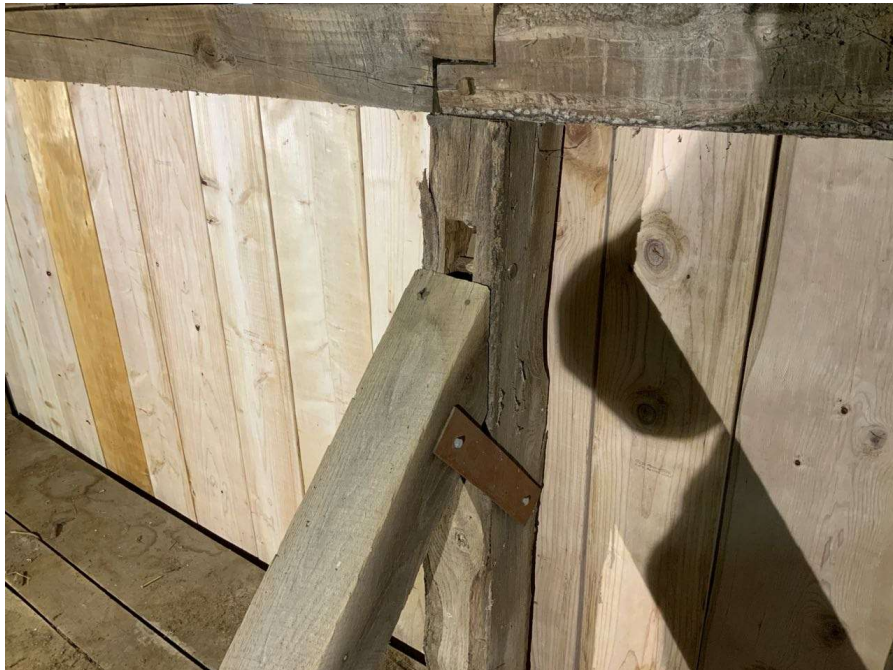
Typical disconnected brace slipping out of the mortise joint at top connection to column at perimeter of structure in hayloft. Column C/1 shown looking northwest. Note the retrofit strap is not oriented correctly to effectively transfer the brace loads.
